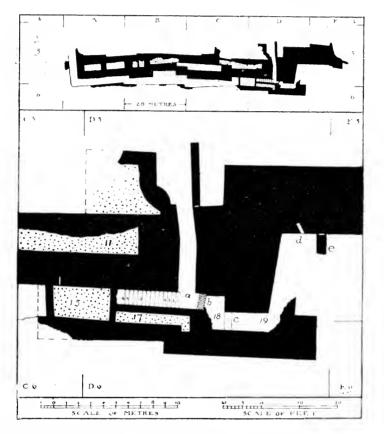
Plan of part of the Town Wall and enlarged Plan showing Staircase, etc.
